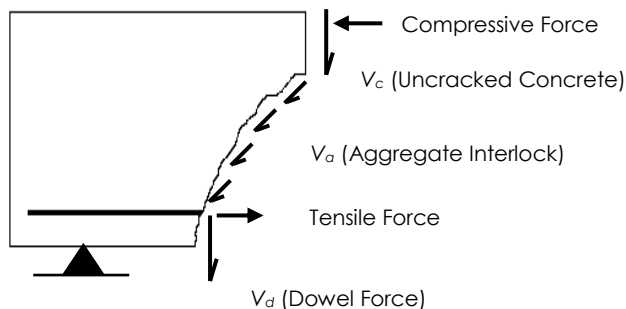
Typical shear crack mechanism acting at reinforced concrete beam without stirrups [5]
